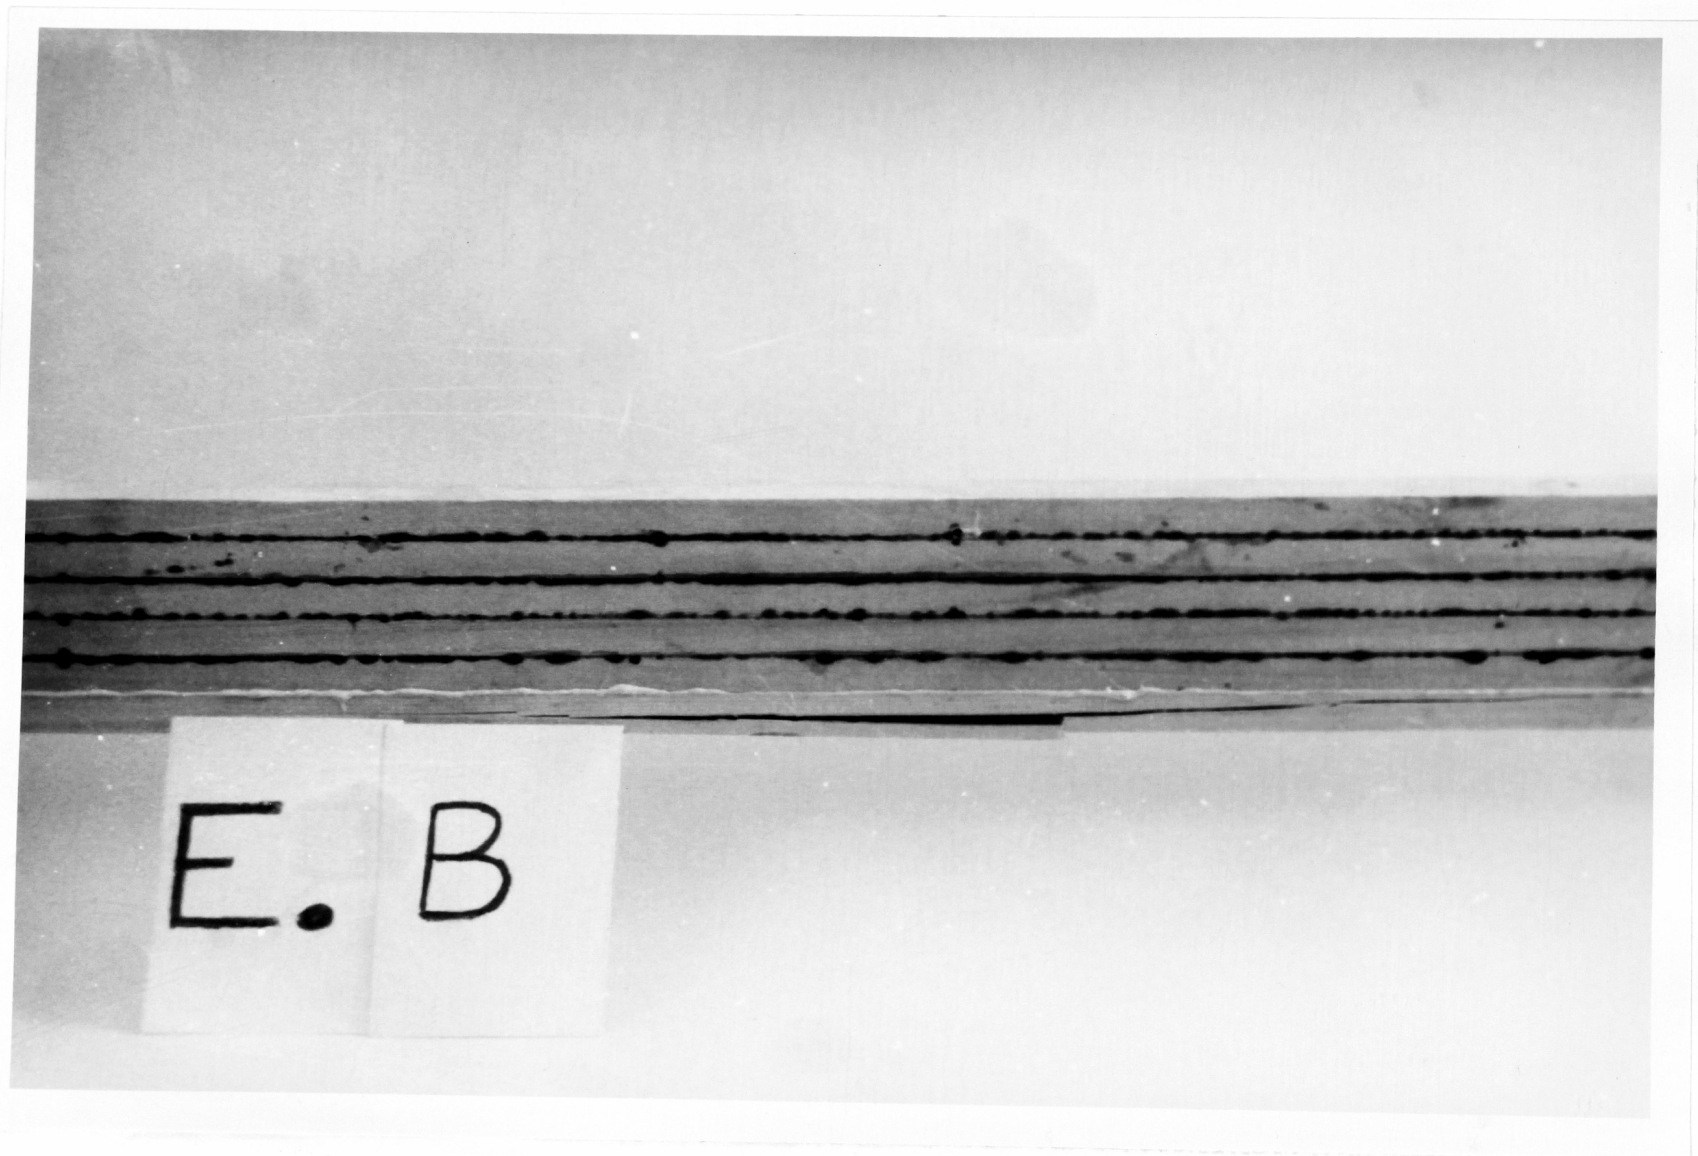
FIGURE VIII TYPICAL FAILURE OF THE EPOXY CONTROL BEAMS, TYPE B
